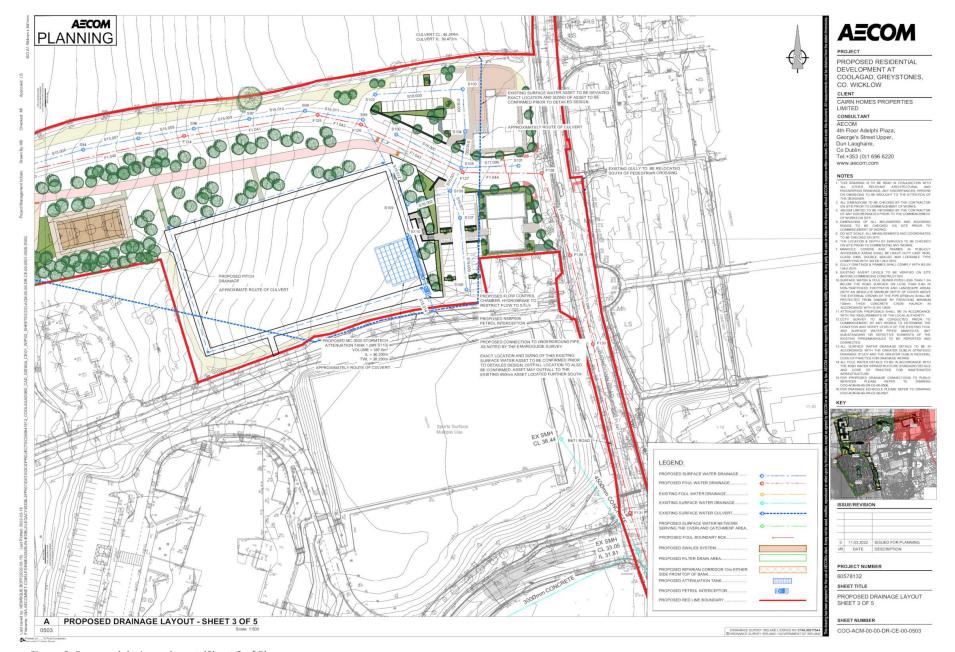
Proposed drainage layout (Sheet 3 of 5)
